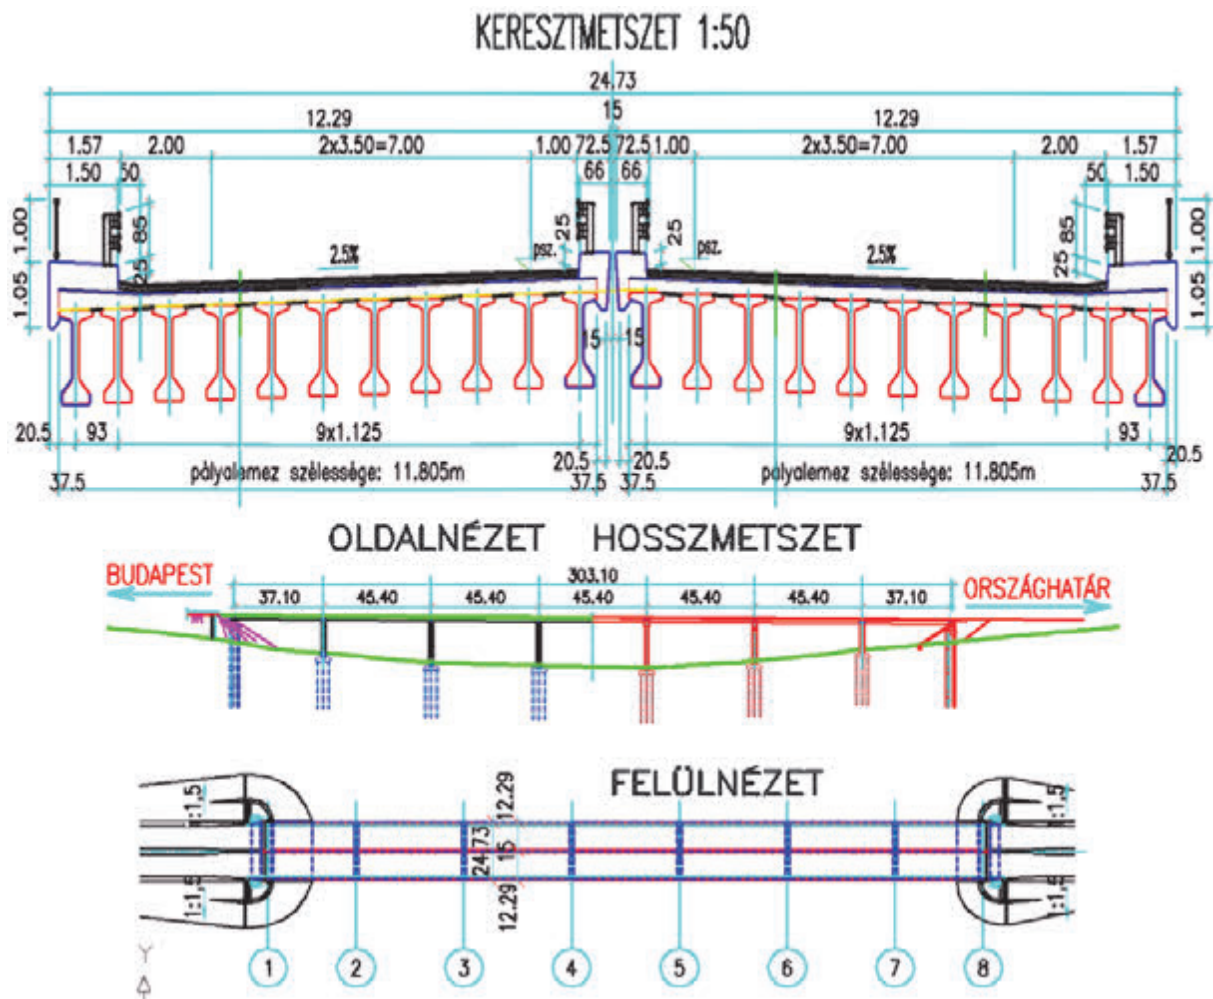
FI-150 girder cross-section, longitudinal section, view from above
